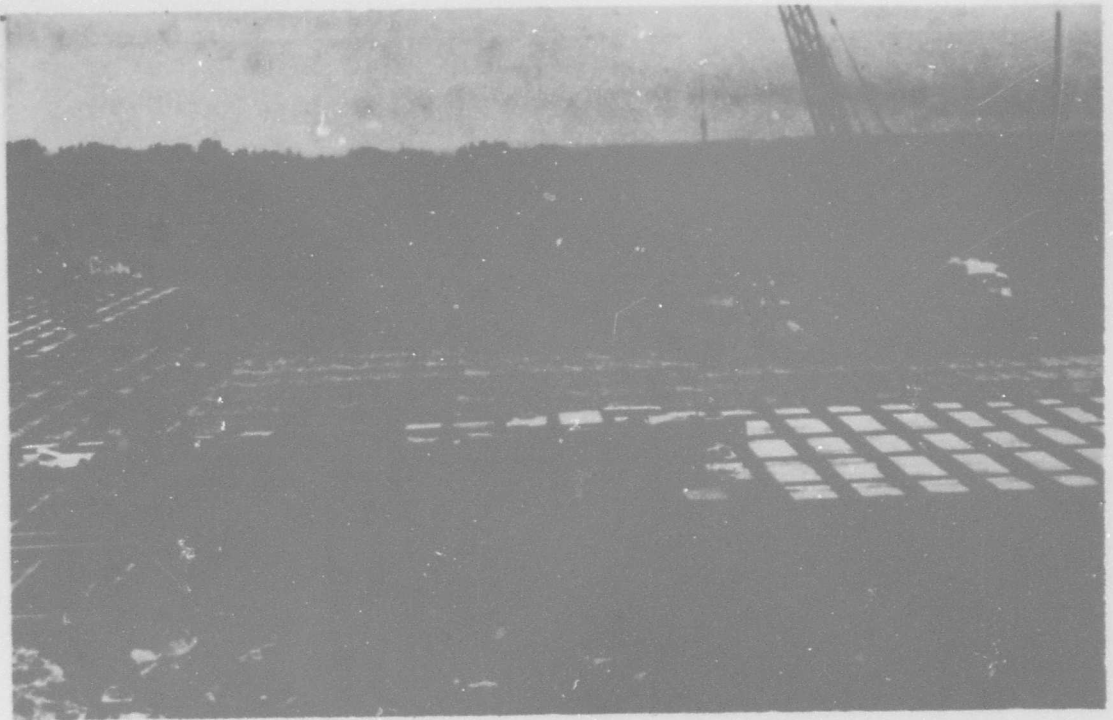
Test Pit View Showing Detonating Cord Racks In Place, Columns, Beams, Subdeck, Earth Fill and Roofdeck.
